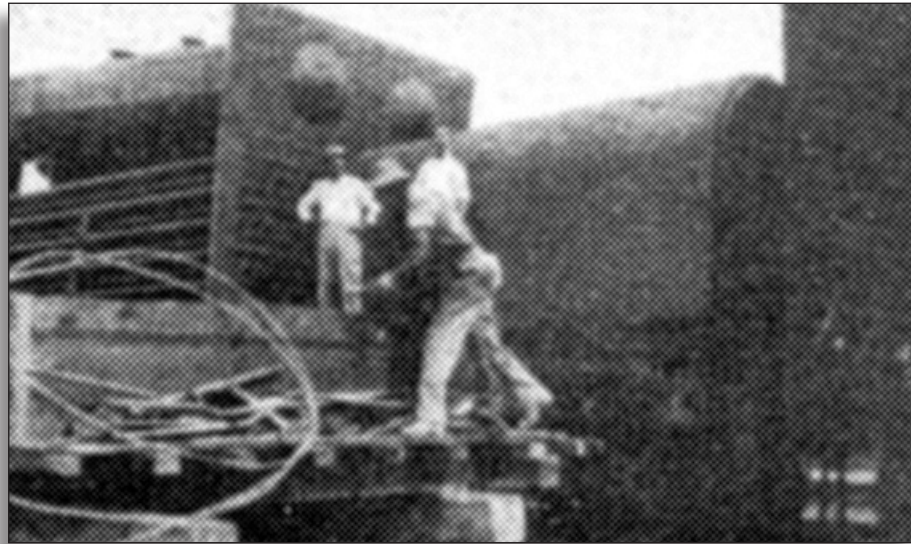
Installing a new pump at unknown river pumping plant (c.1930).
